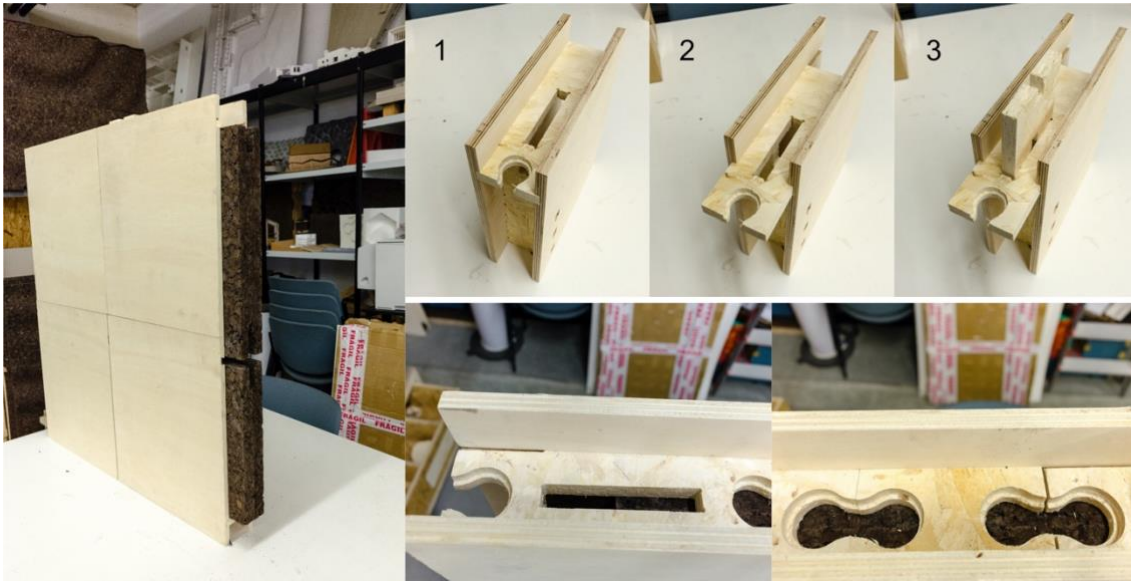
(Left) ORW v2.2 prototype of 4 assembled components; (Top right 1 to 3) Component to component assembly moves; (Bottom right) Connector slots
